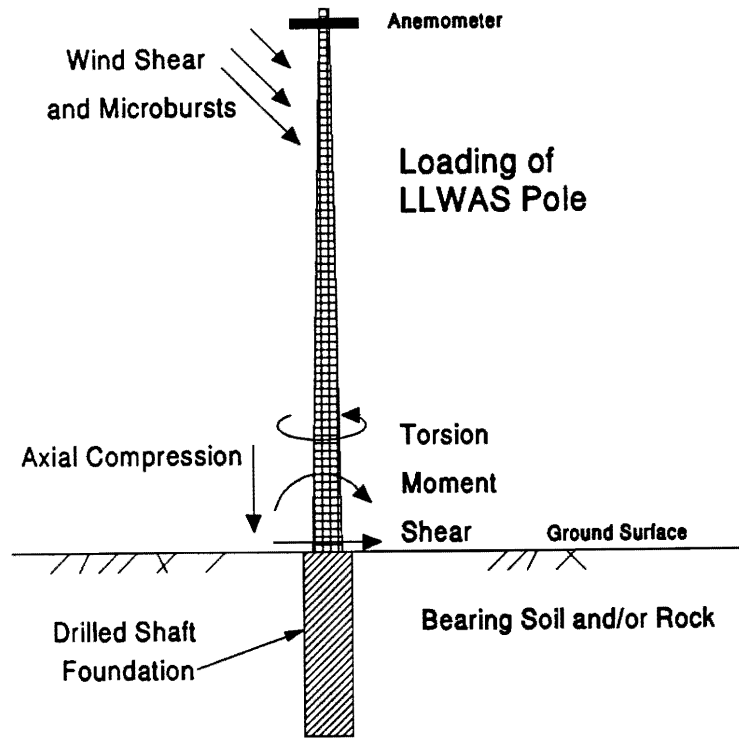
Structural Loading Components of an LLWAS Pole Tower.
